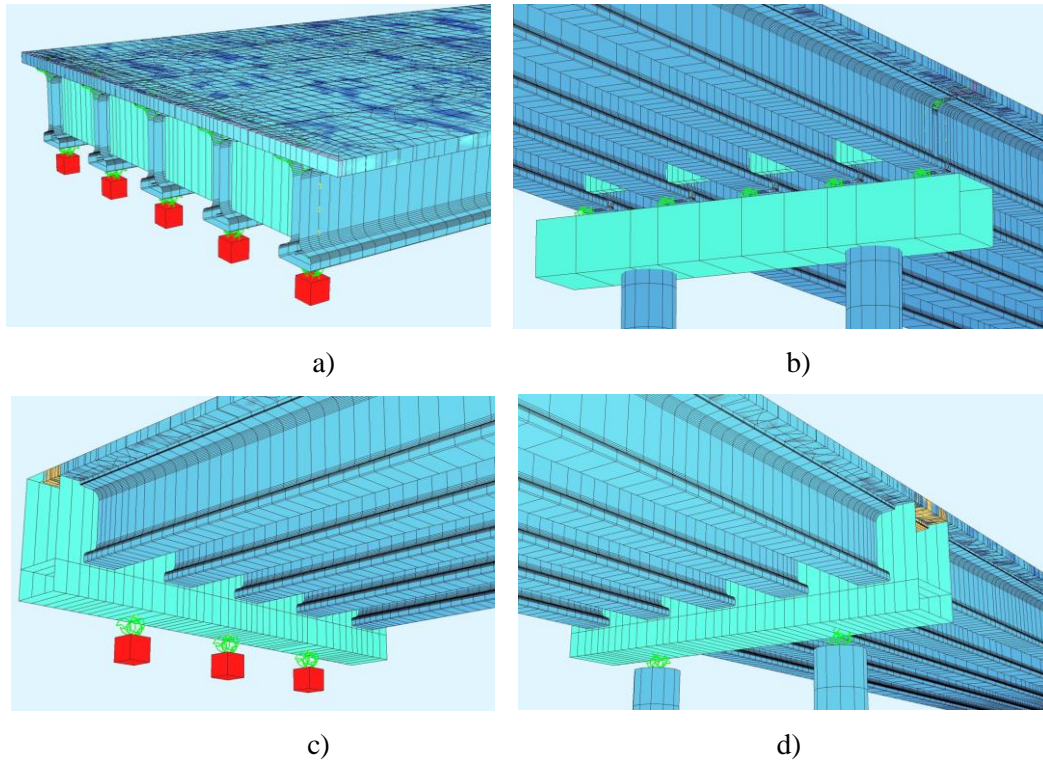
Extract from the bridge models in the software: a) set of simply supported girders supported at the abutment, b) set of simply supported girders supported at the pier, c) continuous superstructures supported at the abutment, d) continuous superstructure supported at the pier
